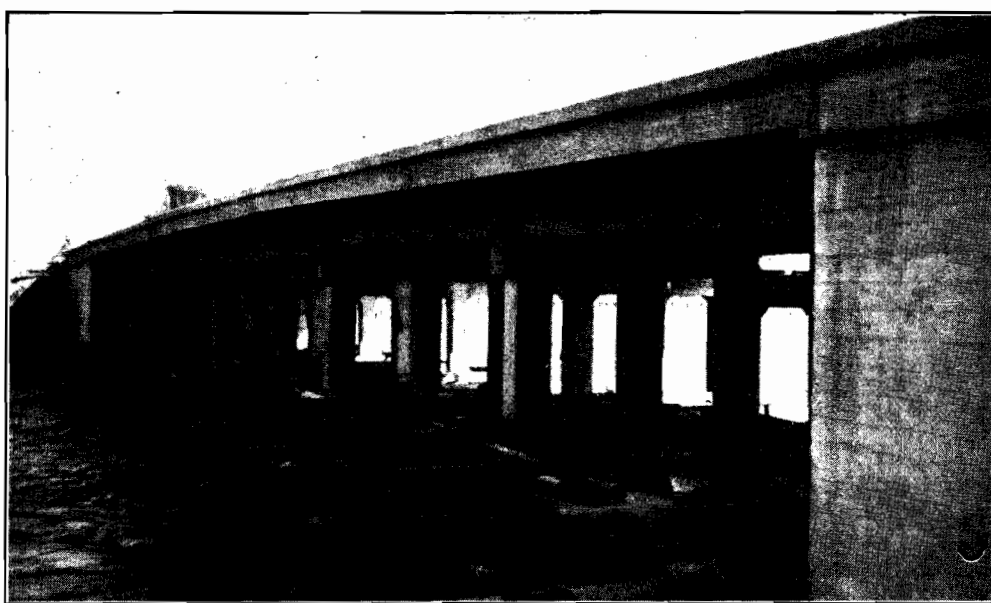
North Arm Bridge, Princes Highway East, Section 4, Showing Bridge Almost Completed.
